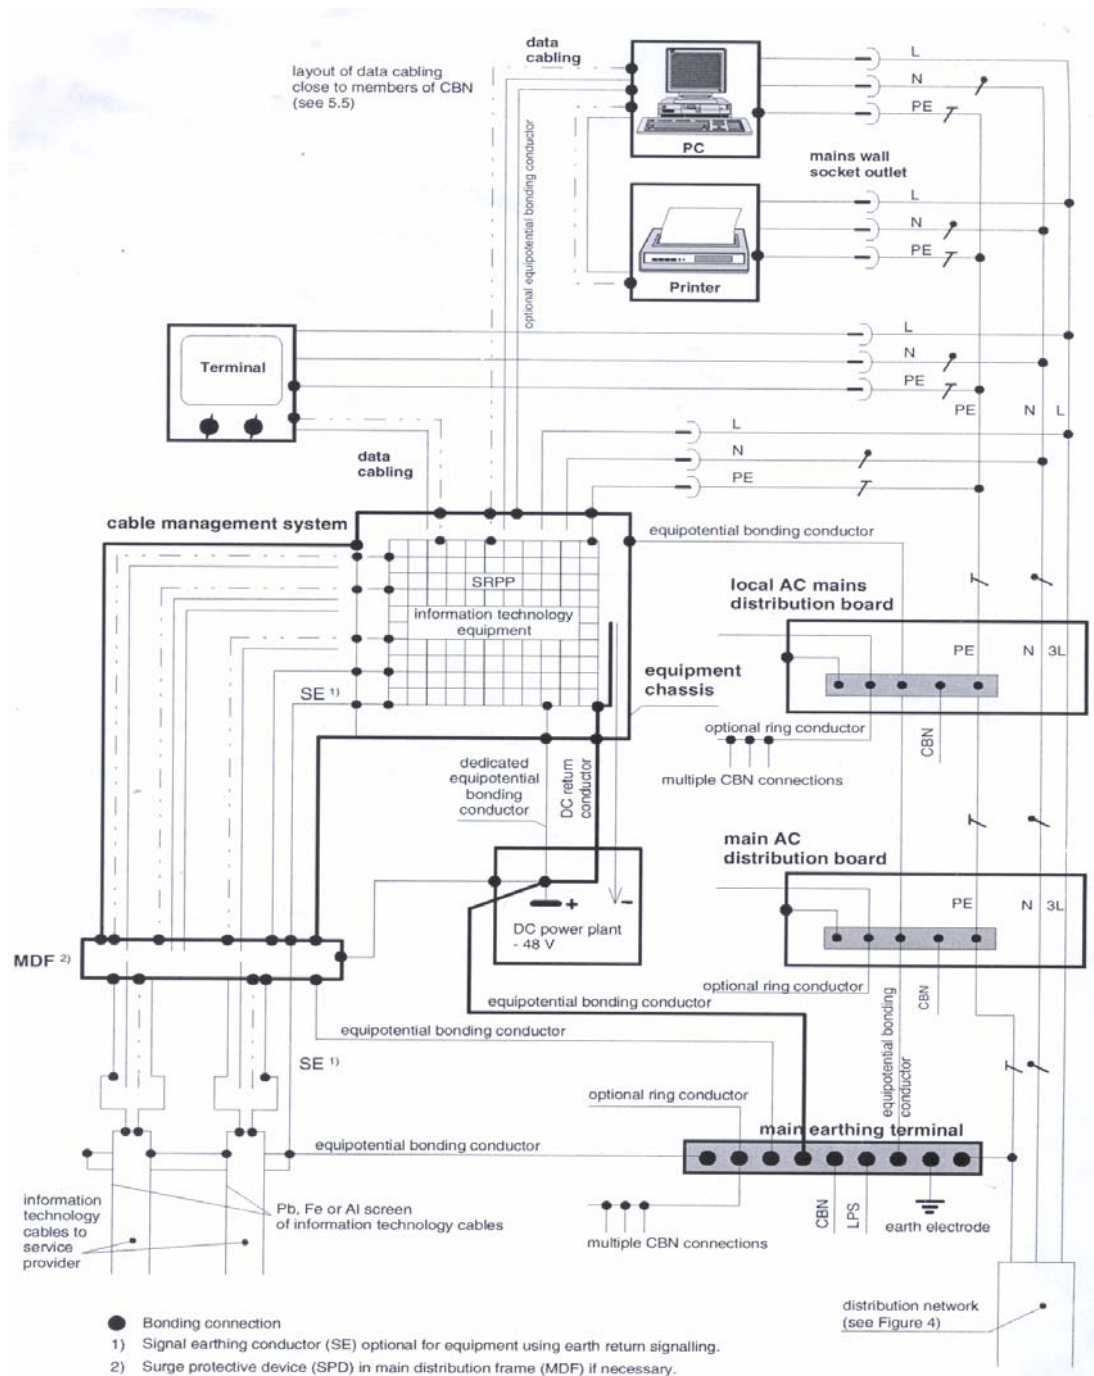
Example of an improved bonding network (CBN/MESH-BN) installation inside a building
